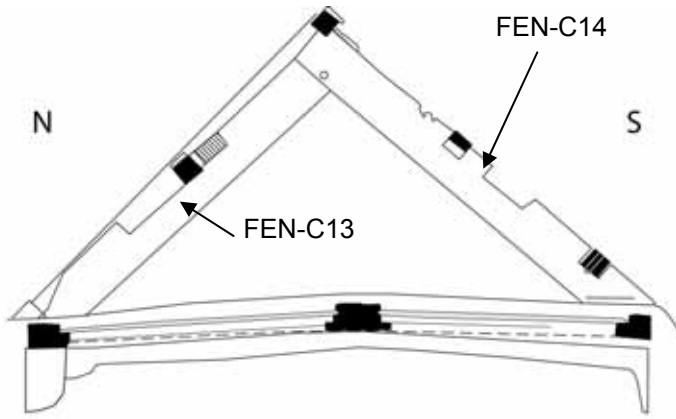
Truss 6, showing the location of samples FEN-C13 and FEN-C14 (based on Truss 4, provided by John Allen)
